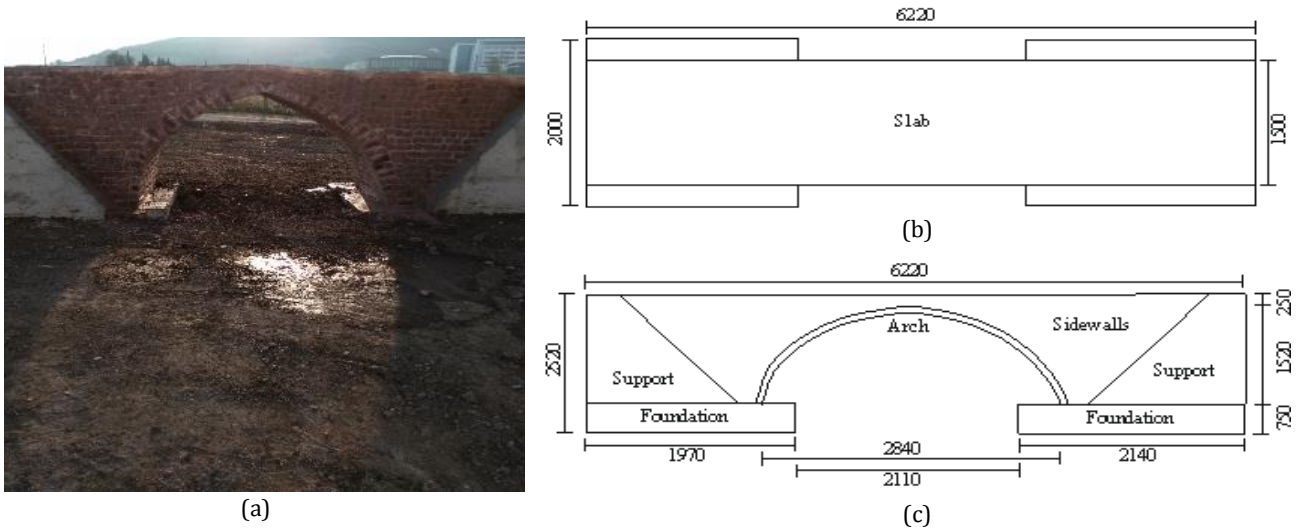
(a) Reduced-scale masonry bridge model; (b) Top view; (c) Front view (mm).
